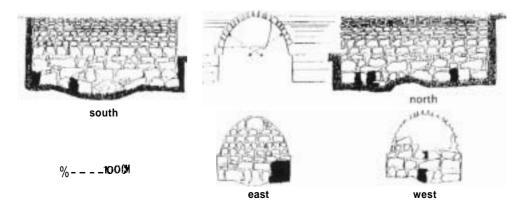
Elevation drawings of the underground soukaway chamber (F.32) in Building A
